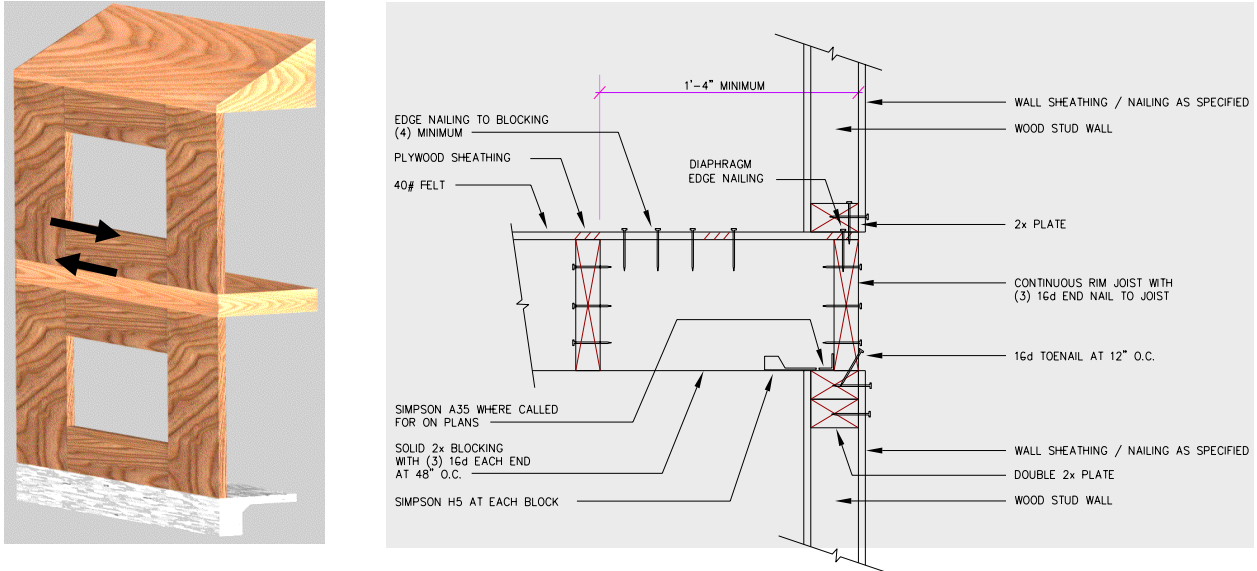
Shear load path for shear walls (Figure credit: FEMA P-1052).
